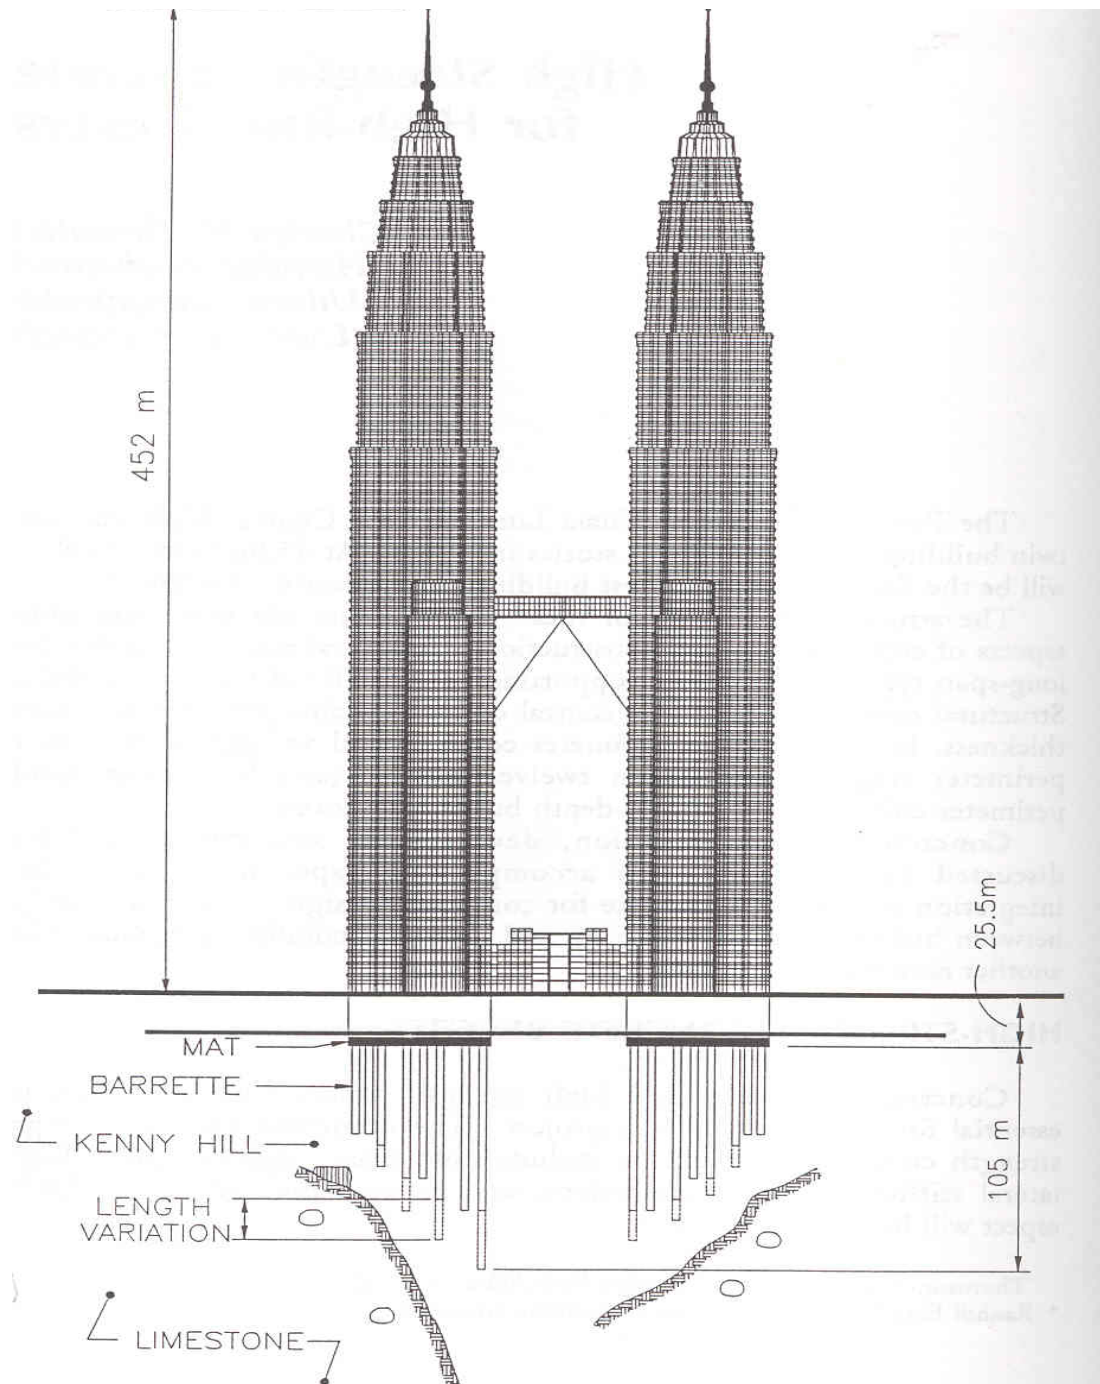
Elevation of Petronas Towers at Kuala Lumpur City Centre
